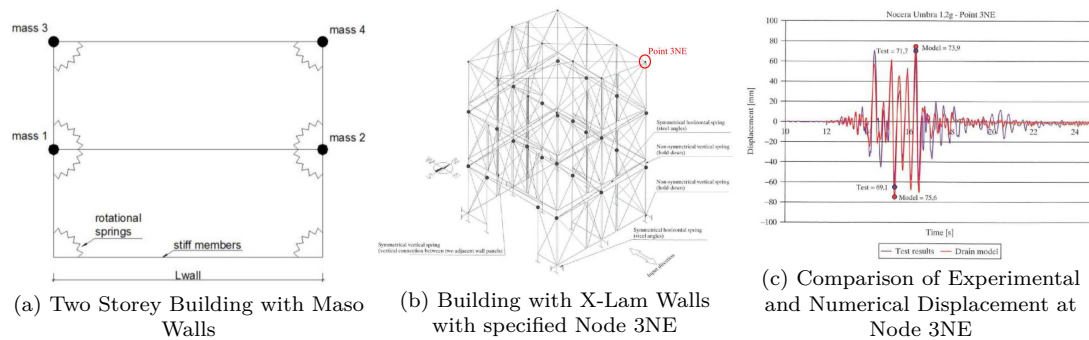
Simplified Model of Building from Maso Walls and X-Lam Timber Structure, Ceccotti and Sandhaas [31]
